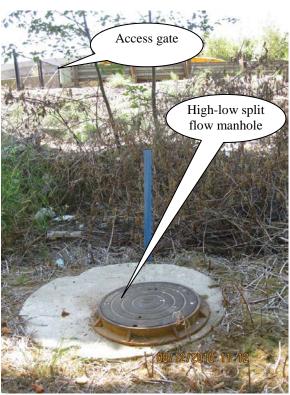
High-low split flow manhole looking towards the south. Access gate is located in the background.
